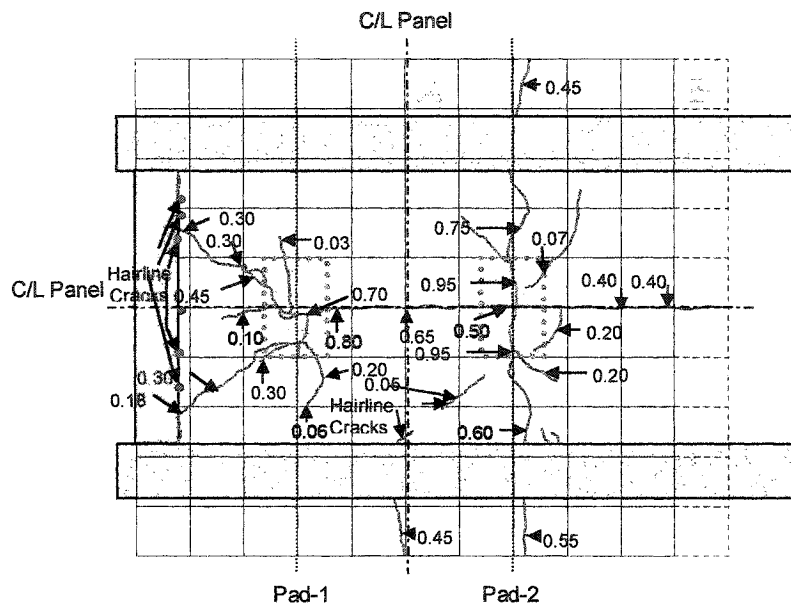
Panel-A: Crack Pattern on Soffit after 1,700 Load Cycles
